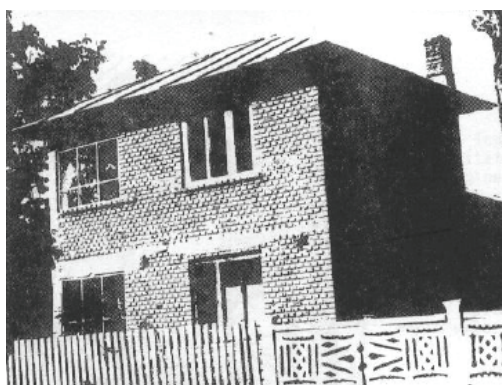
City type rural two storied brick masonry dwelling with RC floor slabs (lintels are embedded in RC floor slab)
